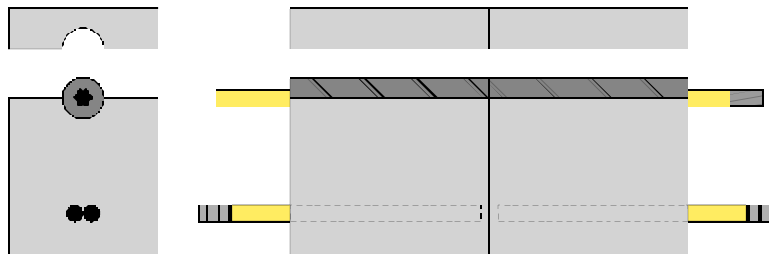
Specimen Opened to Expose Duct/Strand.
